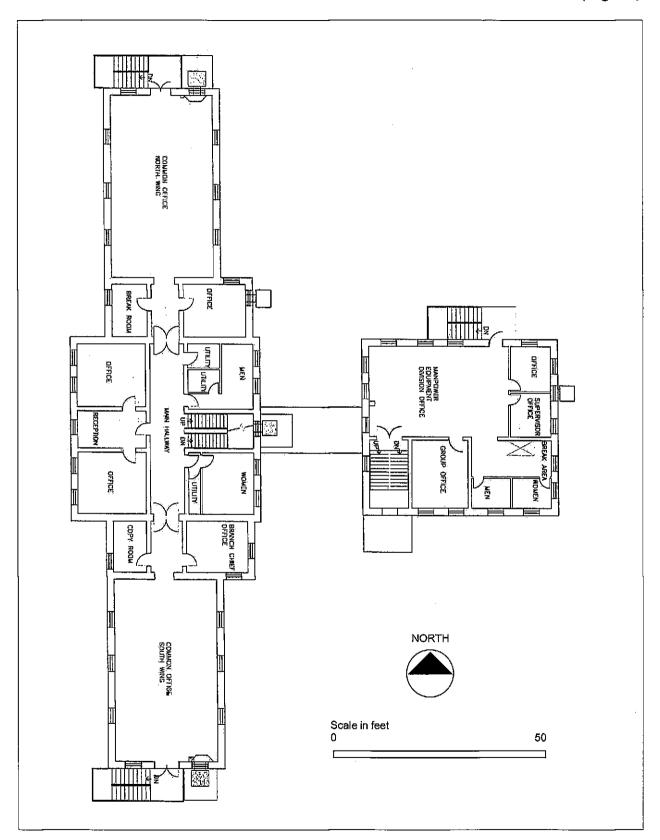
Second floor plan, 2008. Source: HNTB Corporation.
